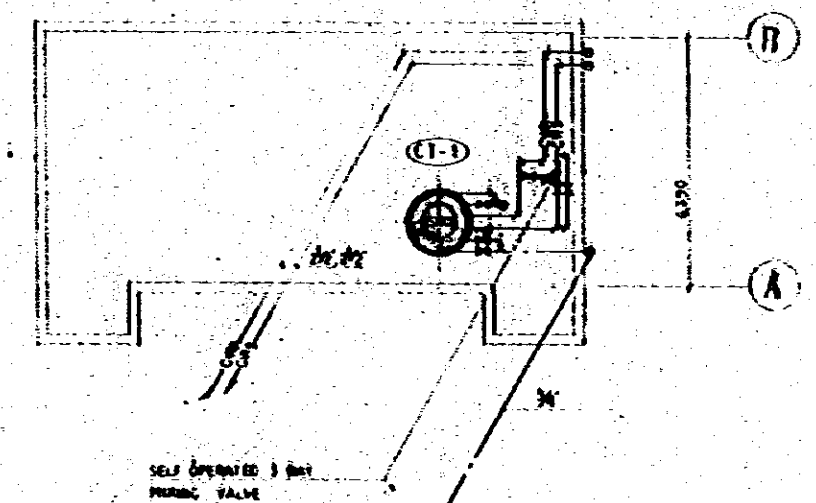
DETAIL OF COMPRESSED AIR PIPING NOT TO SCALE
